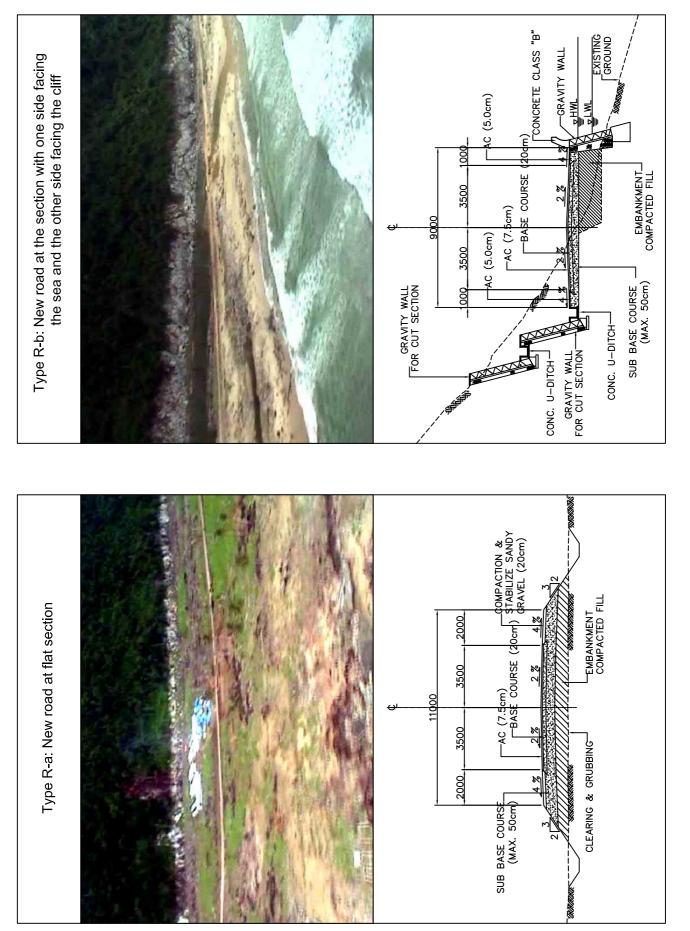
(3/5) TYPICAL CROSS SECTIONS
